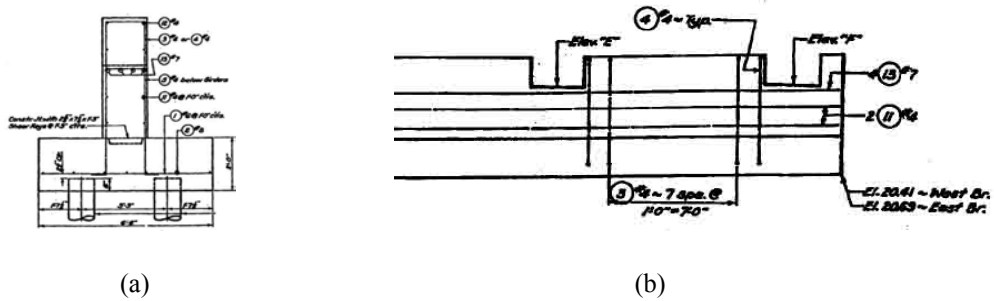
Bridge 5/649 Abutment Footing detail: (a) Cross-section, (b) Elevation
